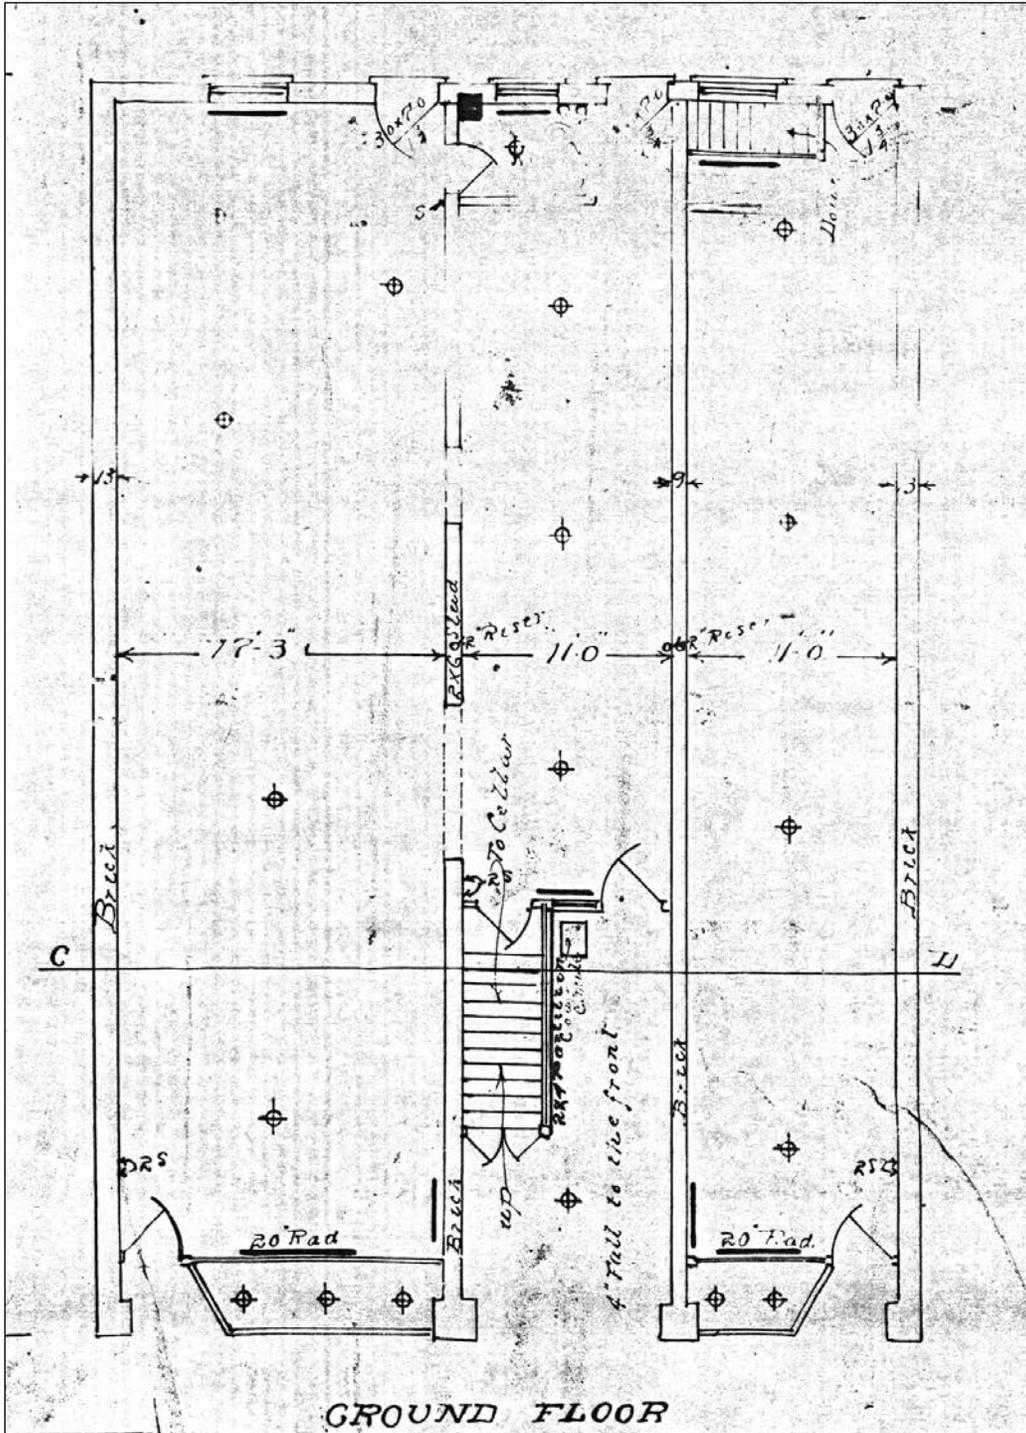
Architect's Plans #456/1912, "Ground Floor". (City of Winnipeg.)
